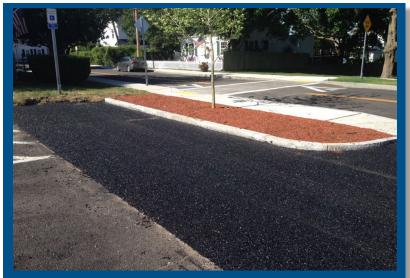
Porous Pavement; Warren, RI
